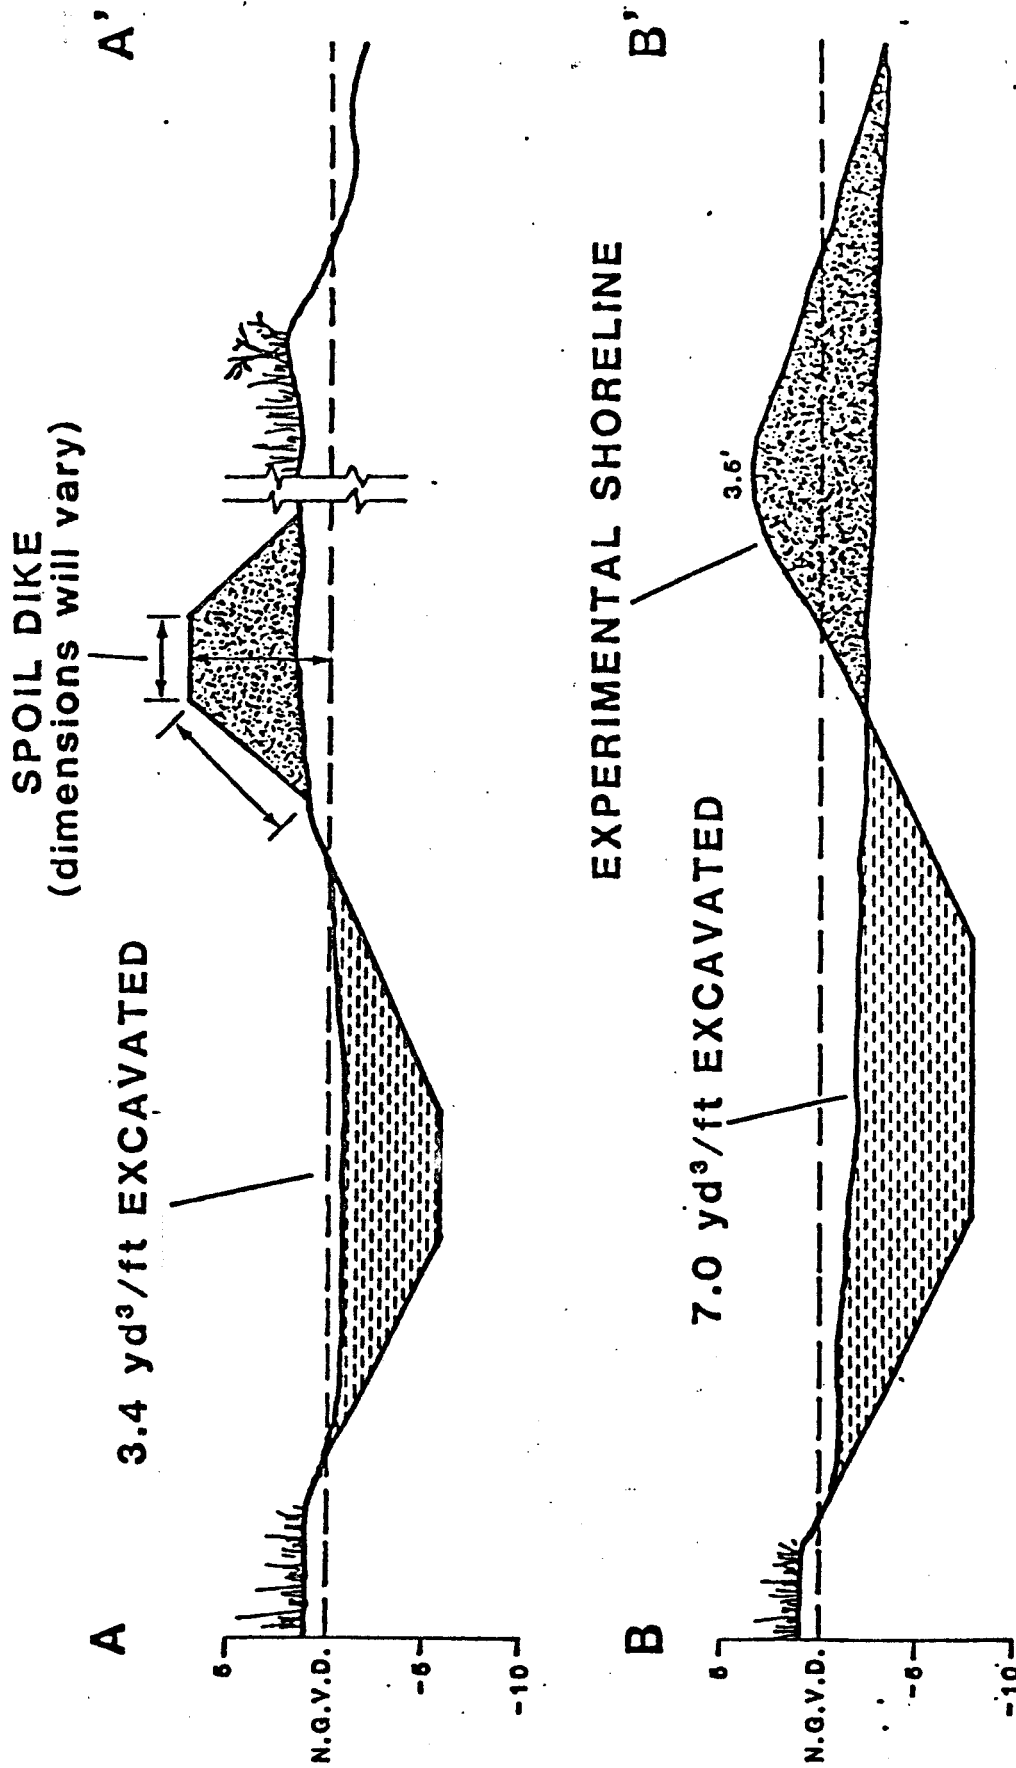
Typical cross-sections of proposed dredging, Eighty Arpent Canal .
